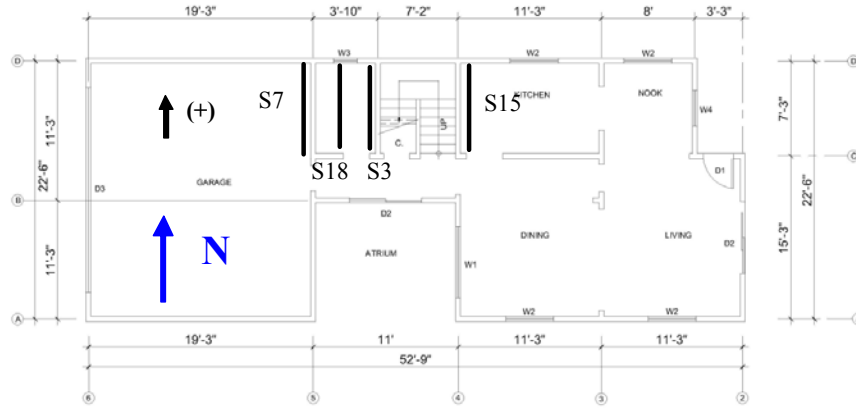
Wall deformations of internal walls for Test NWP5S01
